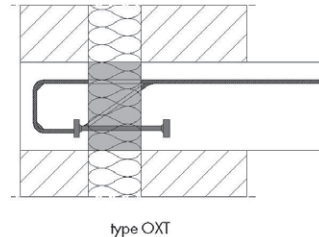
Range of Schöck Isokorb Thermal Insulation Connection Systems (continued)
